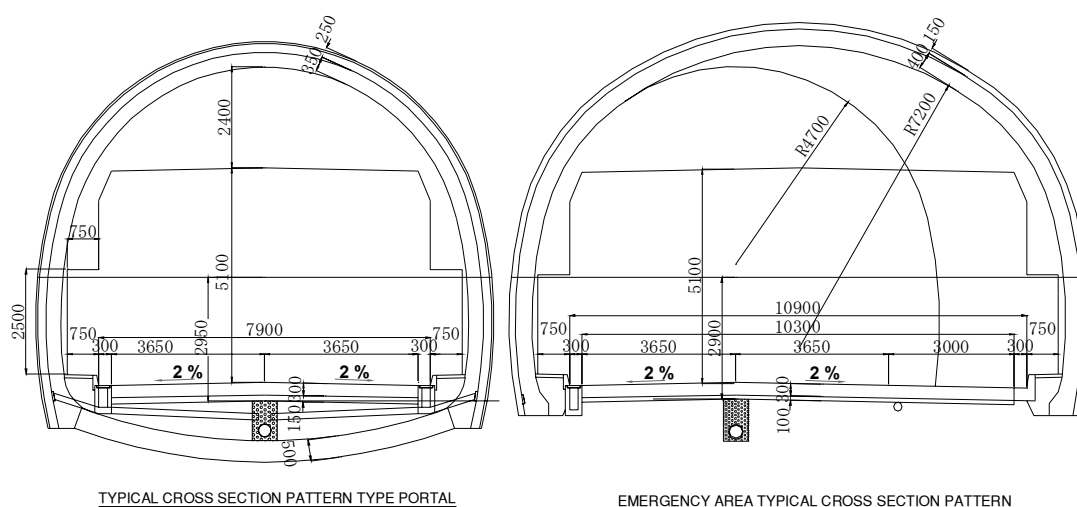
Typical Cross Sections of Portals and Emergency Parking Bays
